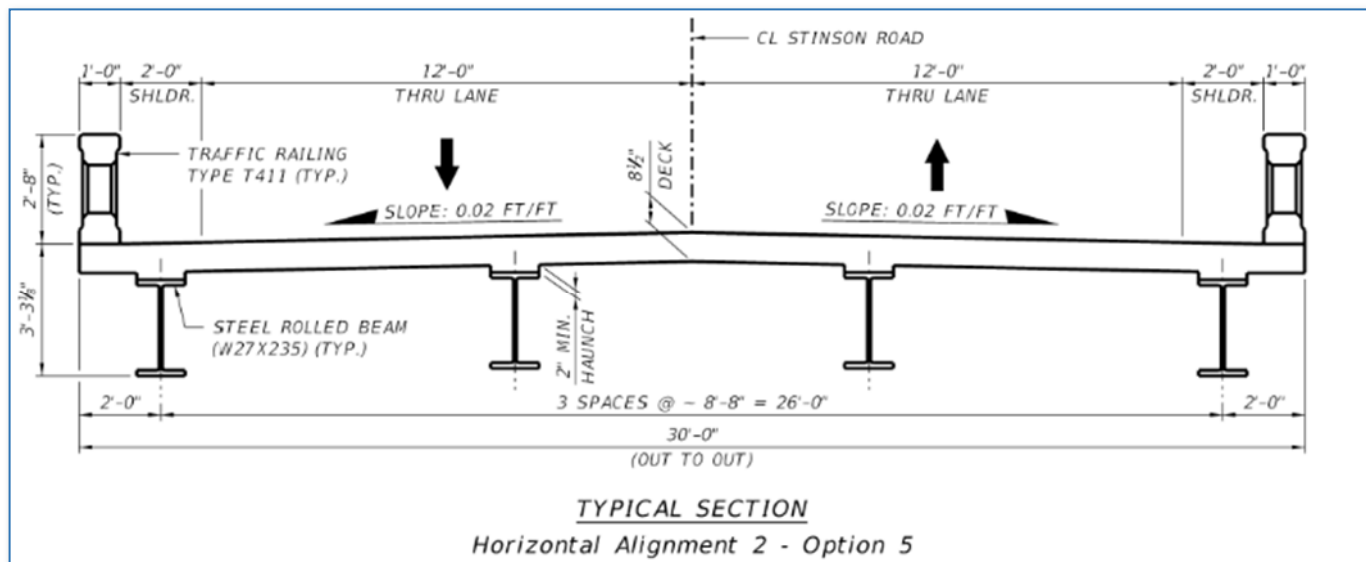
Steel Rolled Beams (W27X235) Typical Section
